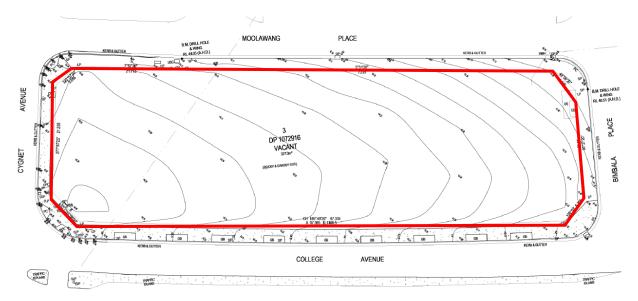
Extract from Site Survey, subject site outlined in red (Source: Landteam Australia Pty Ltd)
